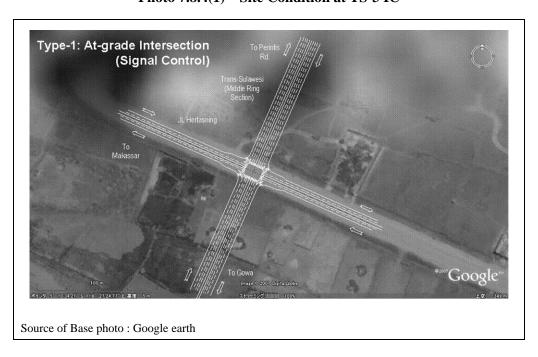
(2) Intersection Plan at TS-3 IC
